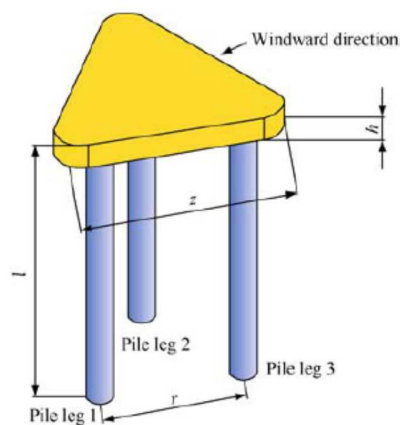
Sketch for typical three-leg jack-up drilling platform
